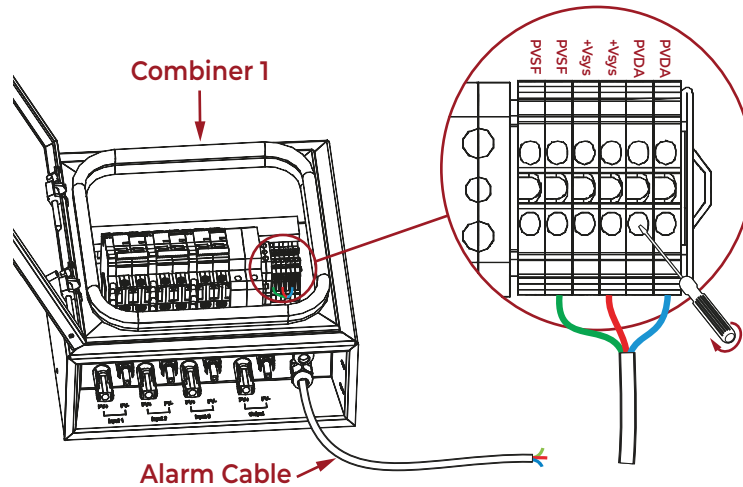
Connecting the Alarm Cable to PV String Combiner #1
